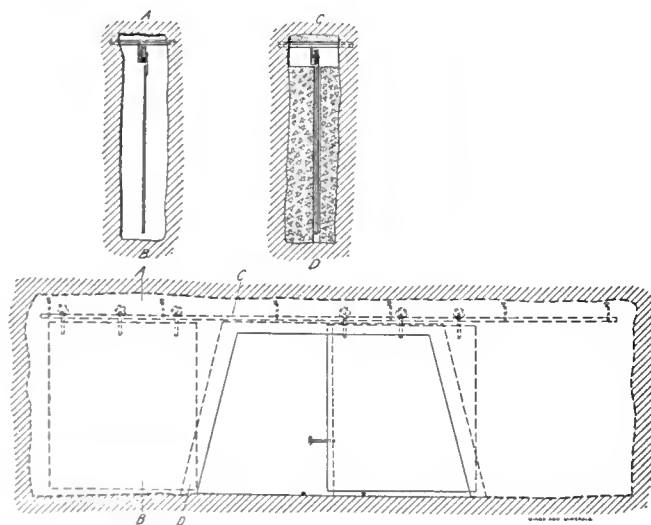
PLANS AND SECTIONS OF MINE DOOR
